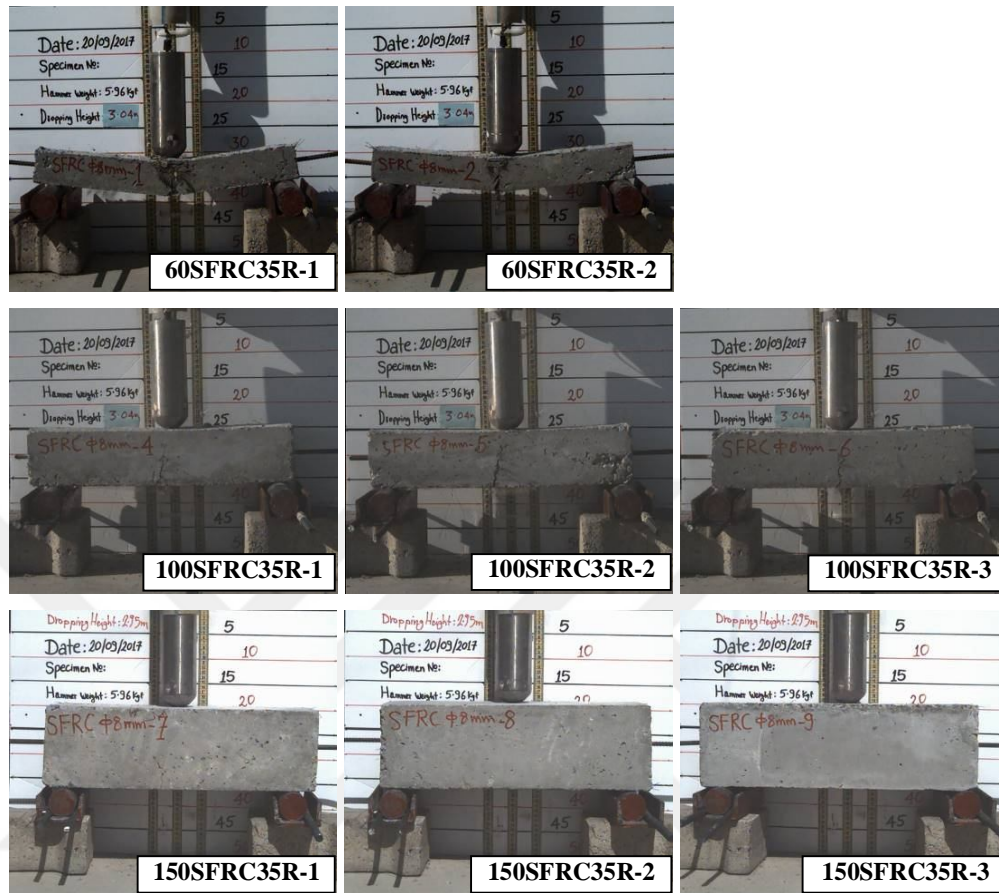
Failure modes of Batch 3 SFRC reinforced specimens (Groups 14, 16, and 18)
